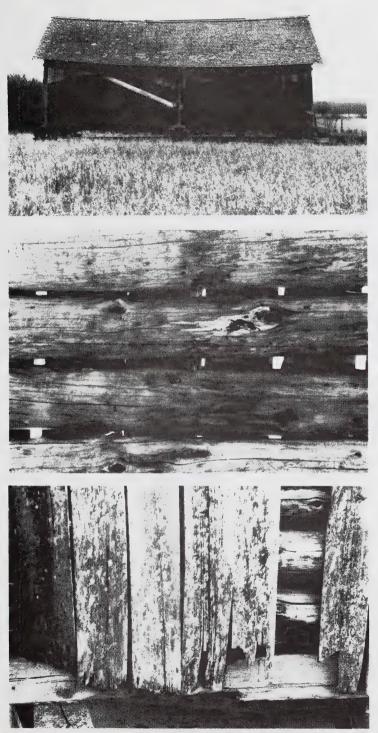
Top, the Chernochan machine shed supported by bracing and standing on timber blocks. Centre, wall logs held together by wooden dowels. Bottom, foundation beam and rotted cladding at the north elevation. (Field Photographs, Chernochan Machine Shed, Sonia Maryn.)
